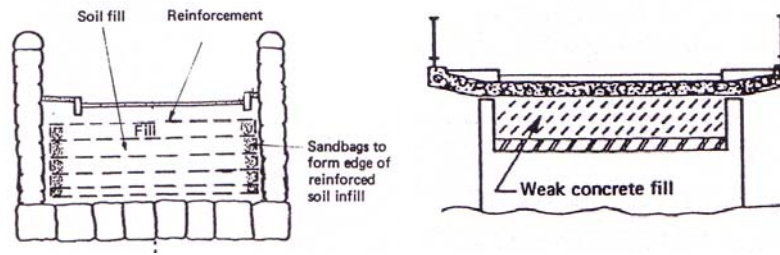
Strengthening of the fill material used for reducing the pressure on the spandrel walls
